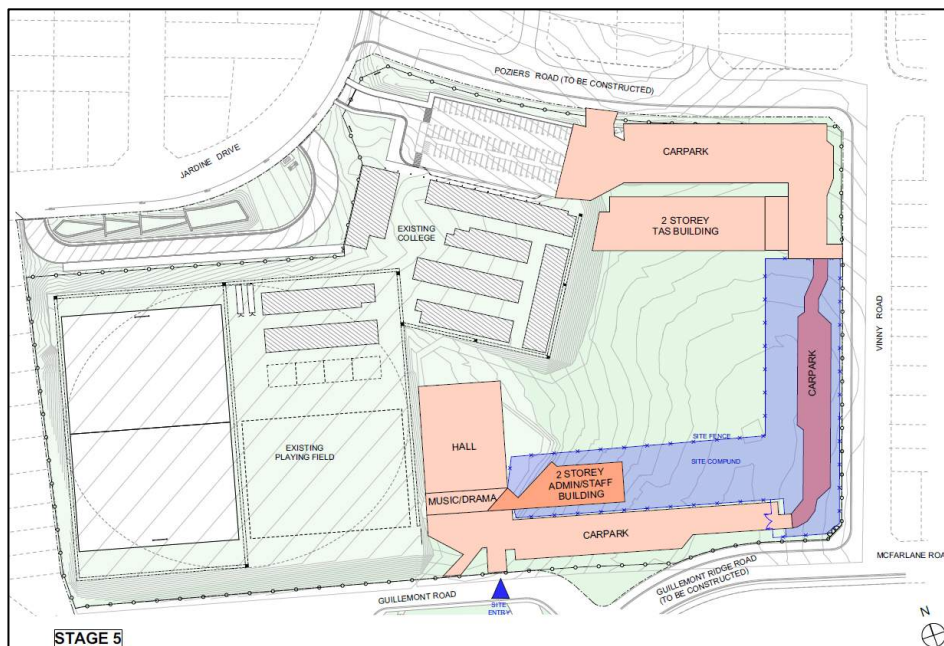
SFCC Masterplan - Stage 5 (Source: JDH Architects)
